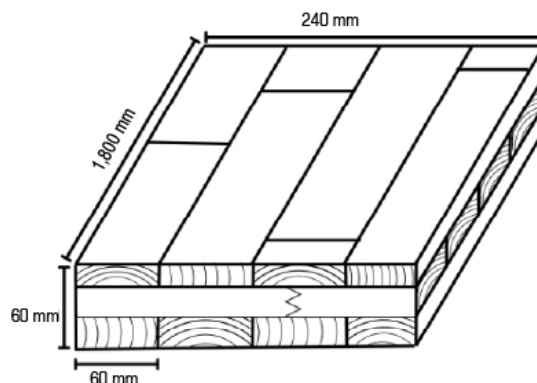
Cross-laminated timber CLT made with Finger Joint.
